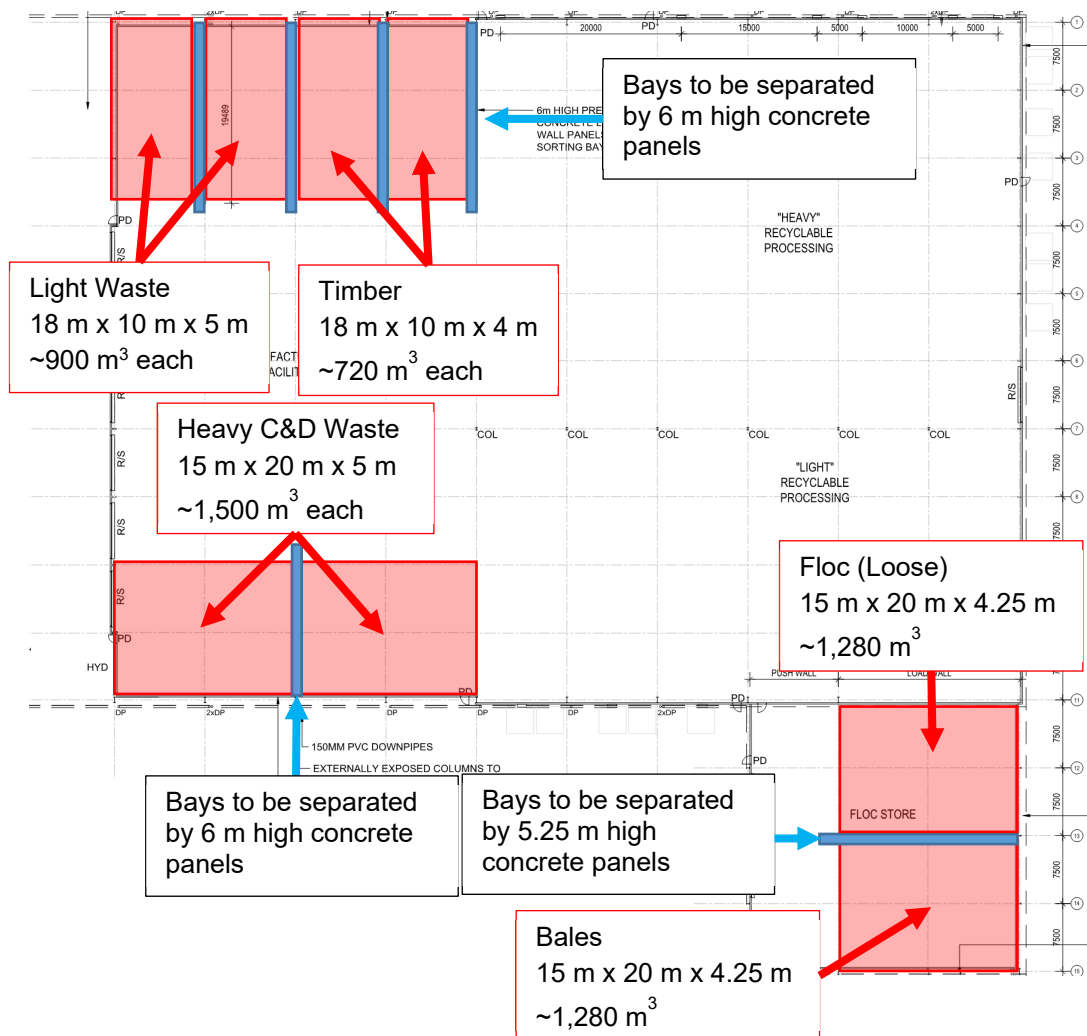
Internal Stockpiles and Indicative Separating Walls for Waste Processing Building
